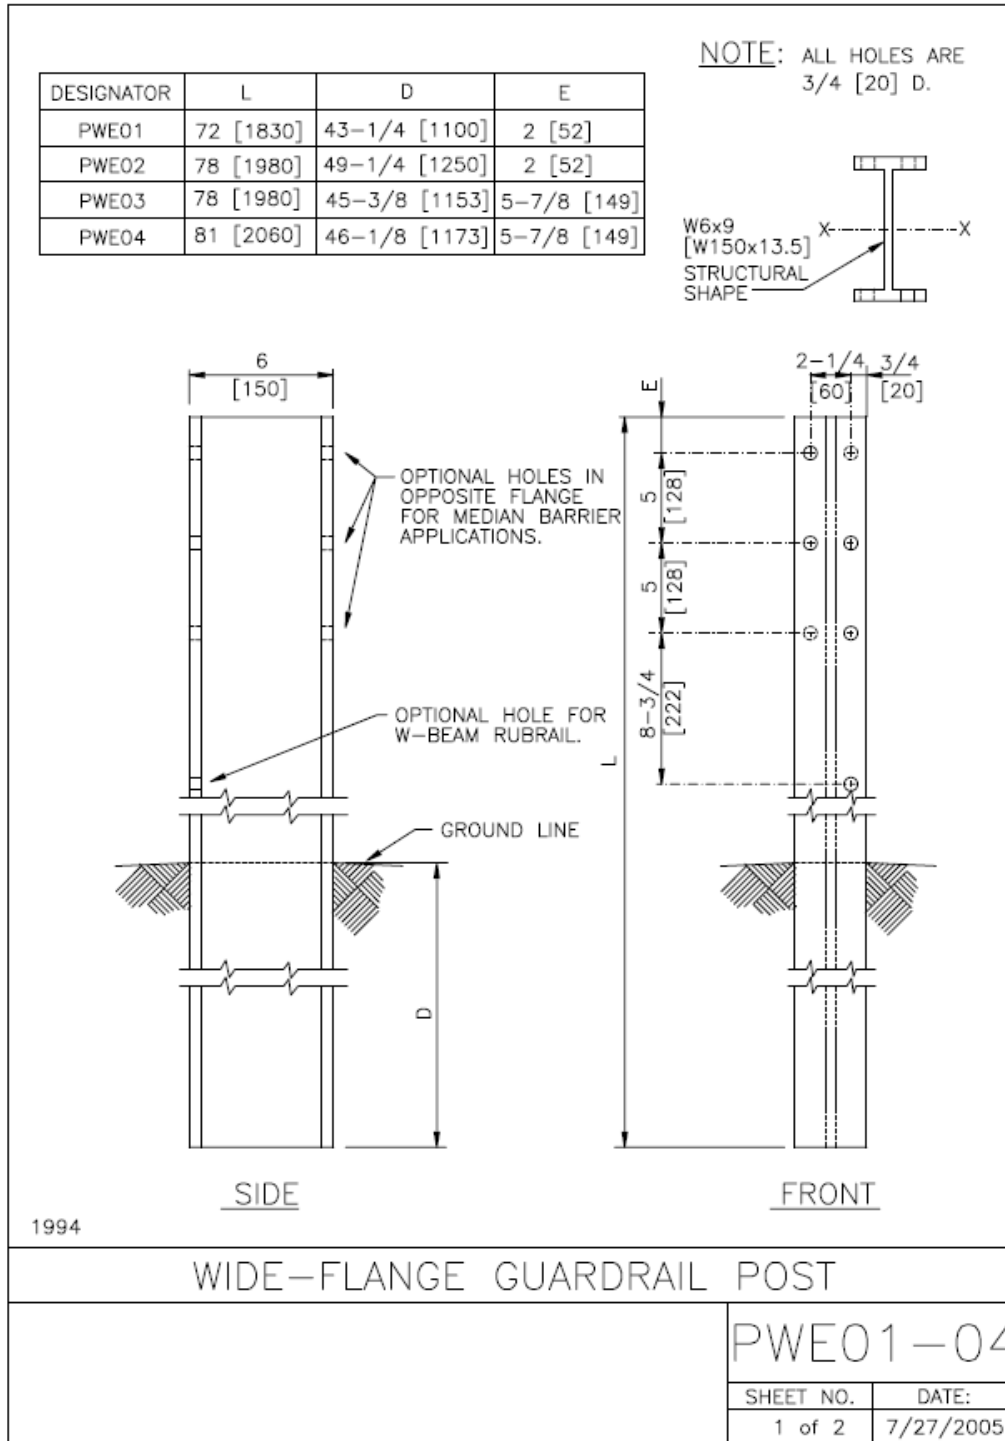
Drawing of the W6x9 guardrail post (PWE01).
